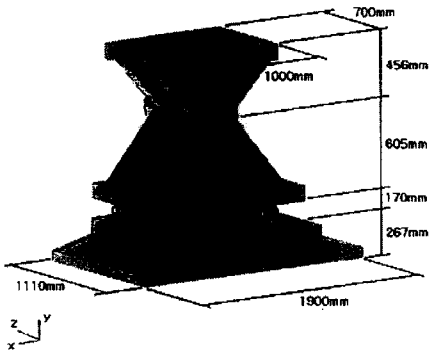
Schematic drawing and dimensions of a movable bearing shoe
